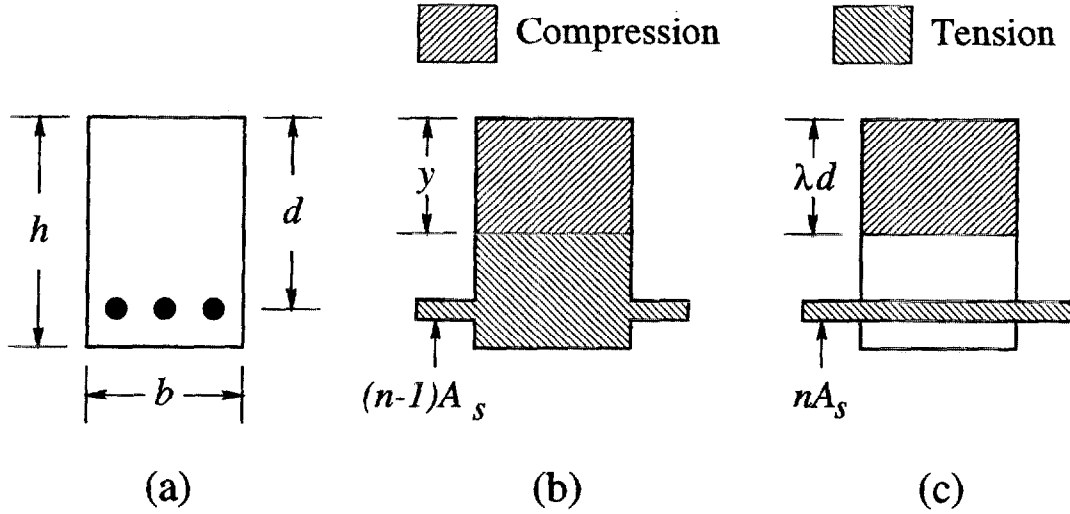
Roof geometry used for analysis: (a) original cross section showing location of steel reinforcement (filled circles); (b) transformed section used for uncracked analysis; (c) transformed section used for cracked analysis.
